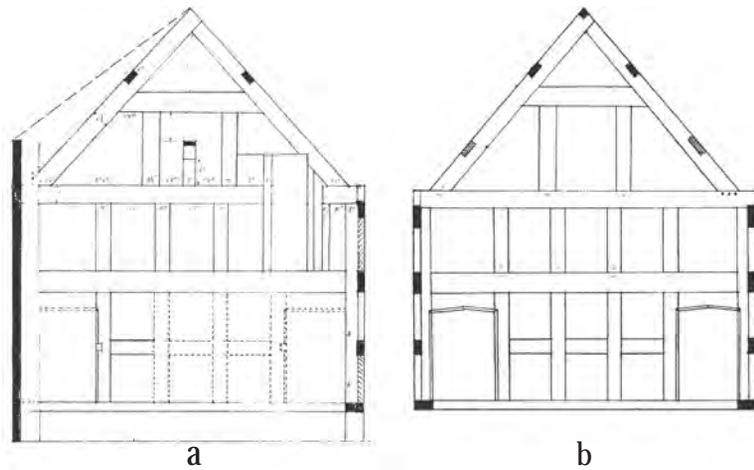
THE HALL. LOWER END OF THE TWO-BAY HALL.
